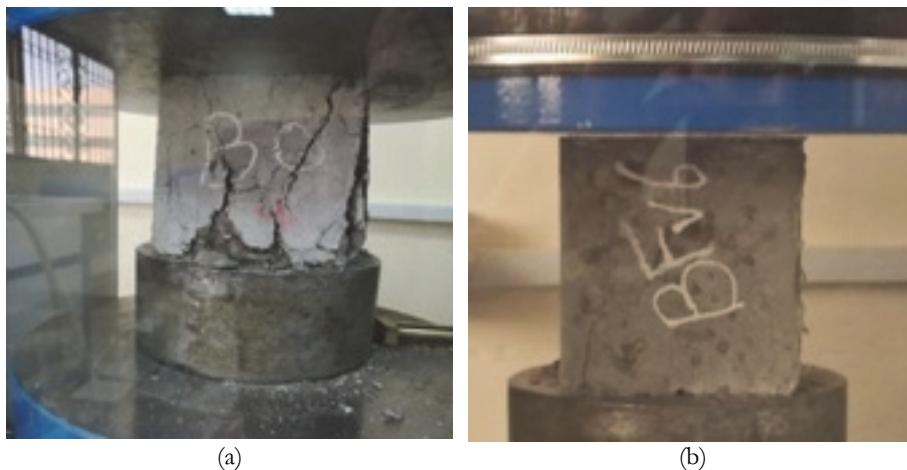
Compressive failure of a specimen made of: (a) ordinary concrete and (b) fiber-reinforced concrete.
